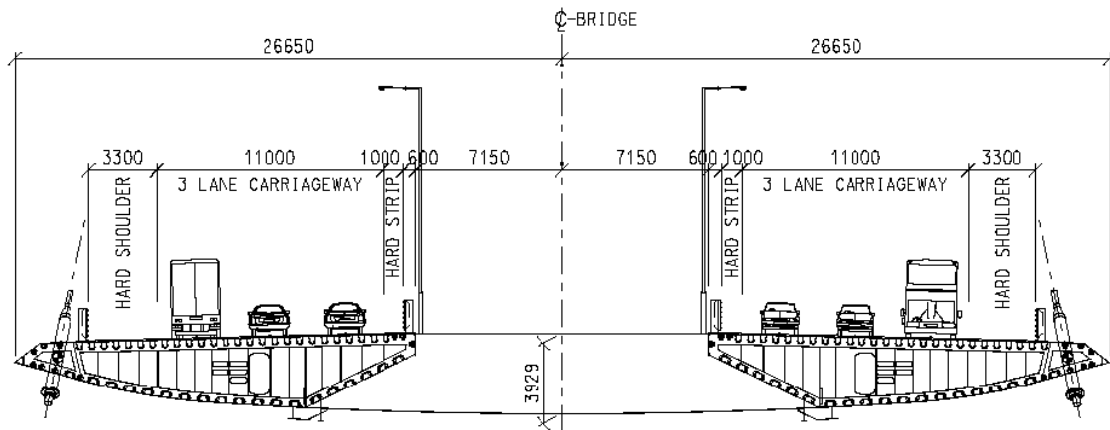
Deck cross-section of Stonecutters Bridge (Unit: mm)
